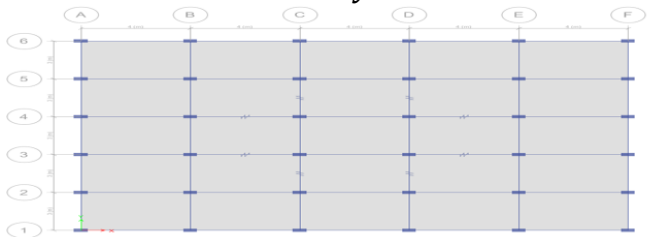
Plan of (G+15) storied building with brick infill wall and infill wall in open ground storey.
